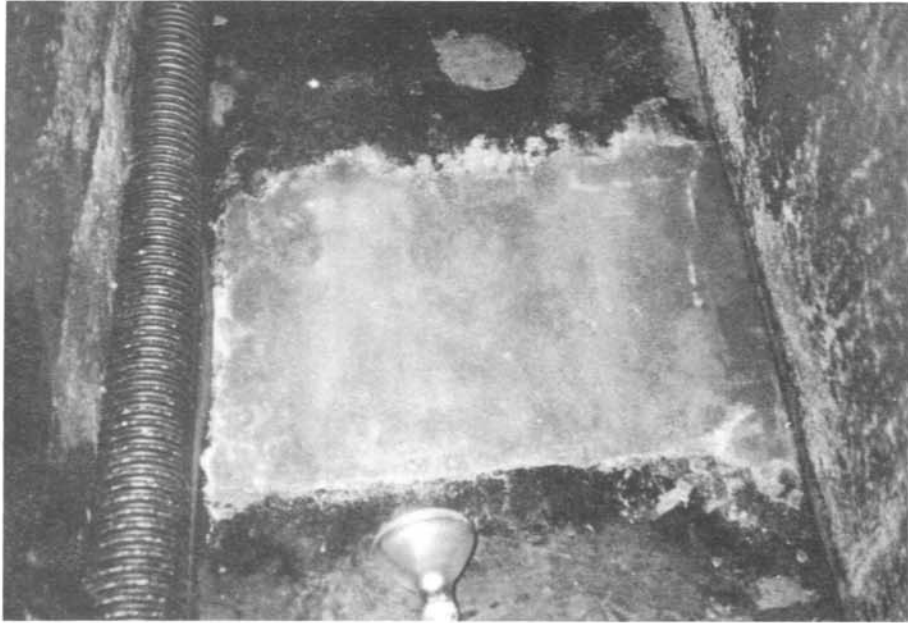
Lemon Dam – Cavitation repair. Protex Probond epoxy concrete repair to the floor of outlet tunnel downstream of the regulating gate. 4/24/88
